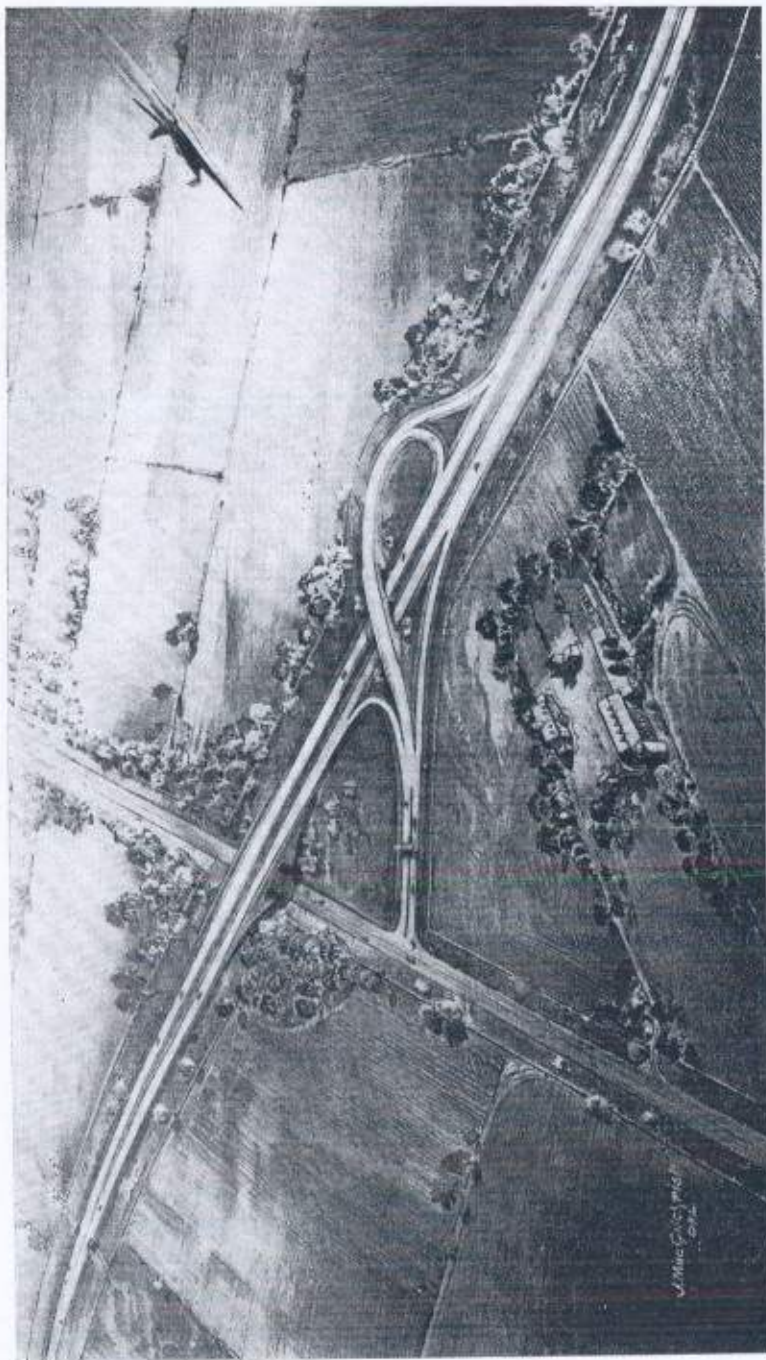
A two-lane toll road widened to four lanes approaching an access point at which only one toll booth is provided, showing the grade separating structure necessary to avoid hazards of left turns on the toll road.
